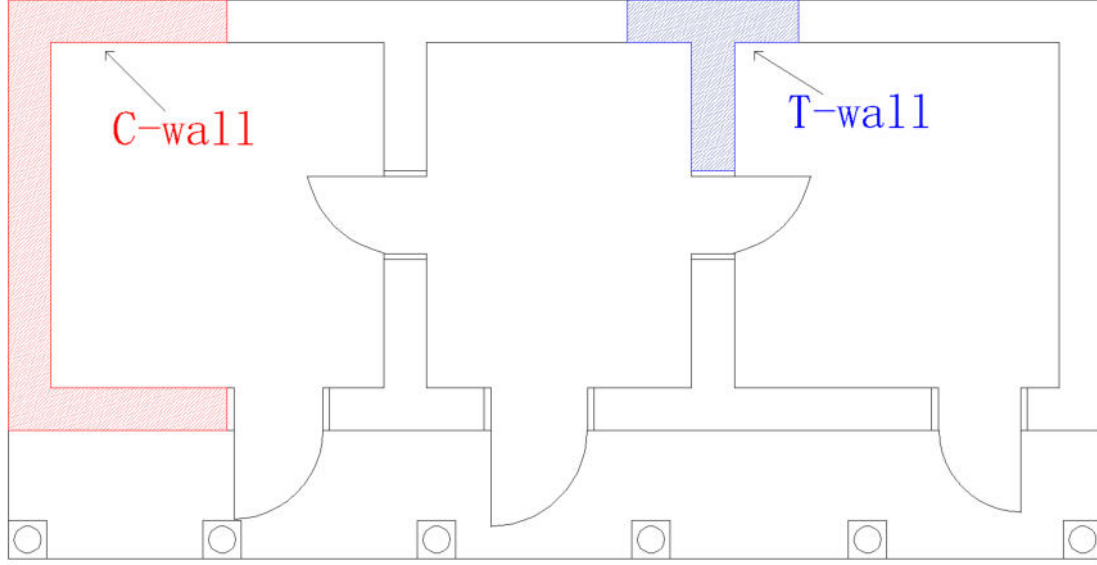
C-wall and T-wall systems as a part of a rammed earth house
